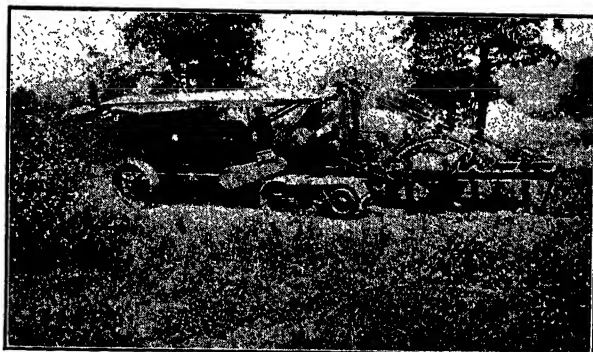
HEAVY DUTY TRENCHING MACHINE
